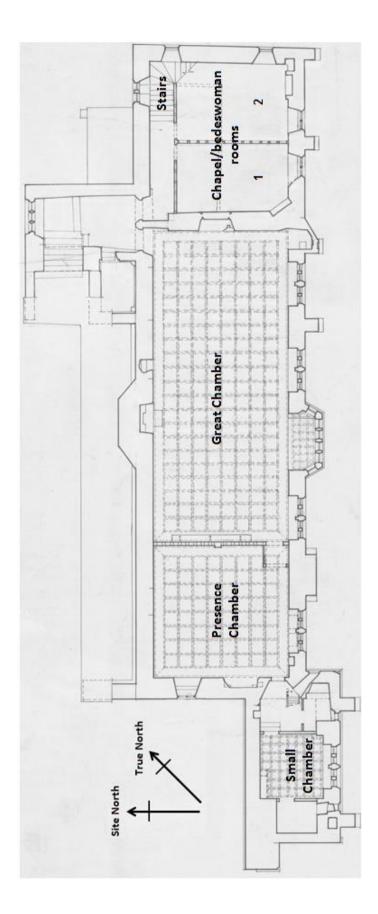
First-floor plan of the Bede House (after HBMC 1986)
